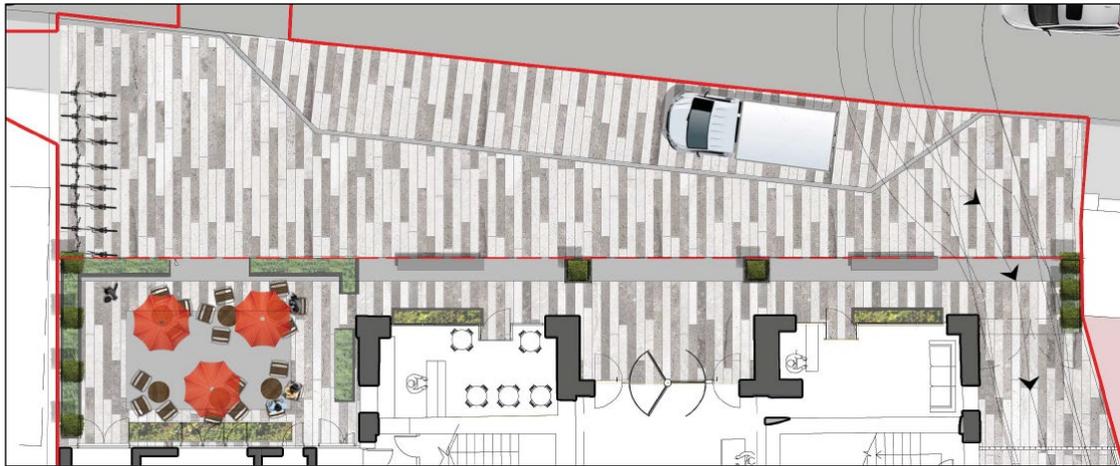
Extract of drawing No. 300 Rev. 2 prepared by The Big Space showing the full extent of works proposed to the site frontage.
